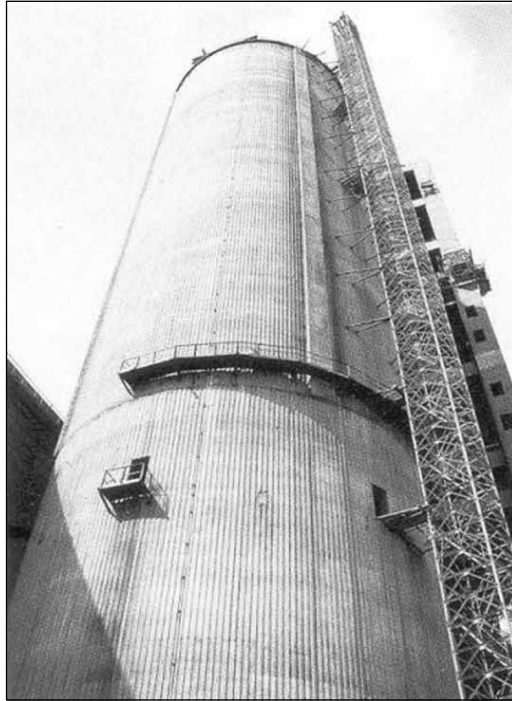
Slipformed Grooved Silo at Tadipatri Cement Plant.
